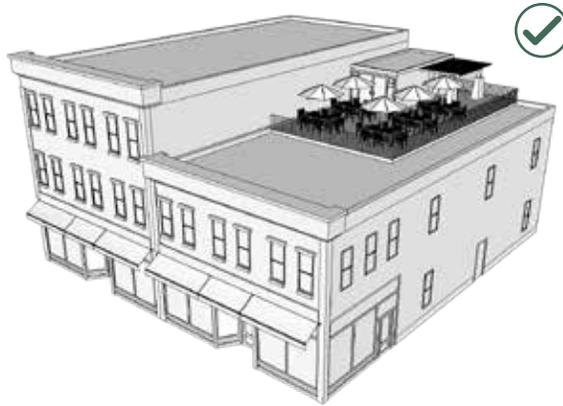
Set back a rooftop deck from the building façade so that it is not visible from the street.
